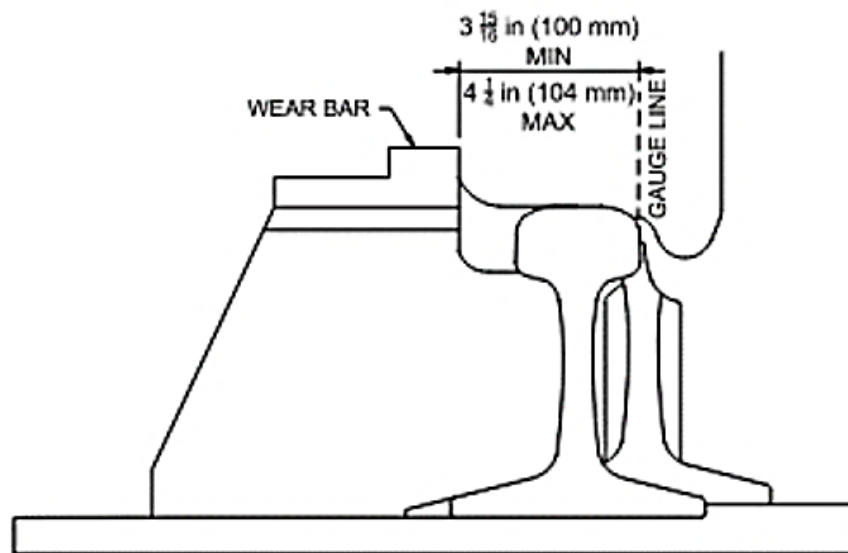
Figure SUB-PART D – 69 – Examples of Switch Point Protector and Switch Point Guard
